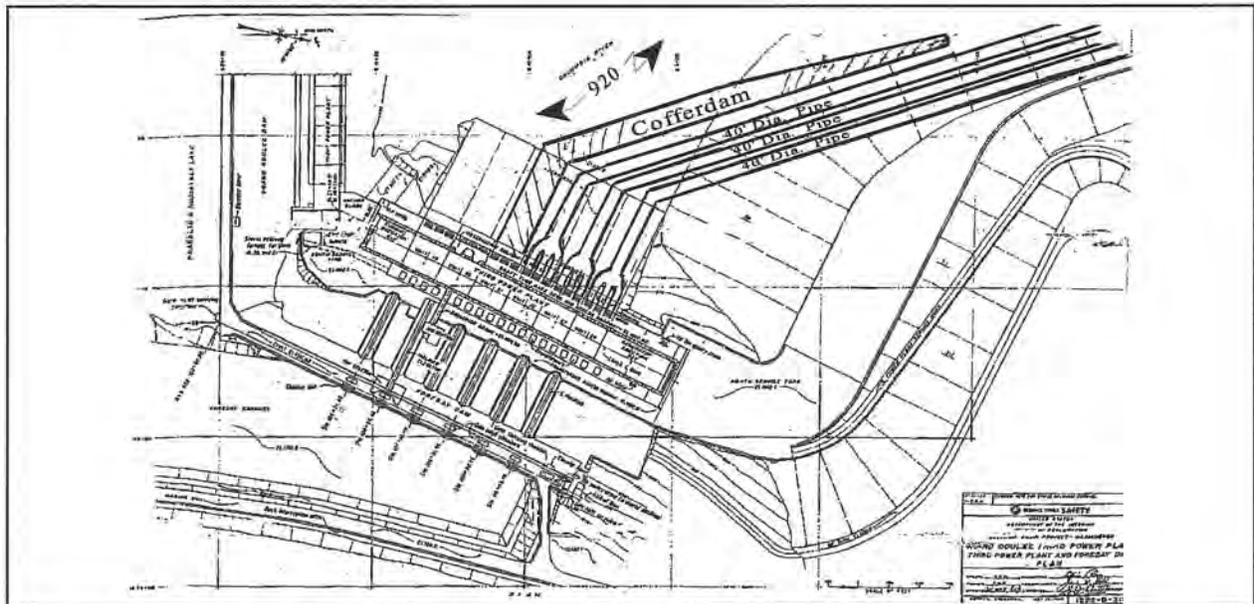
Plan view of proposed penstock attachment to the third power plant units for alternative No. 8. (fn:alter#8-1.wpg)
